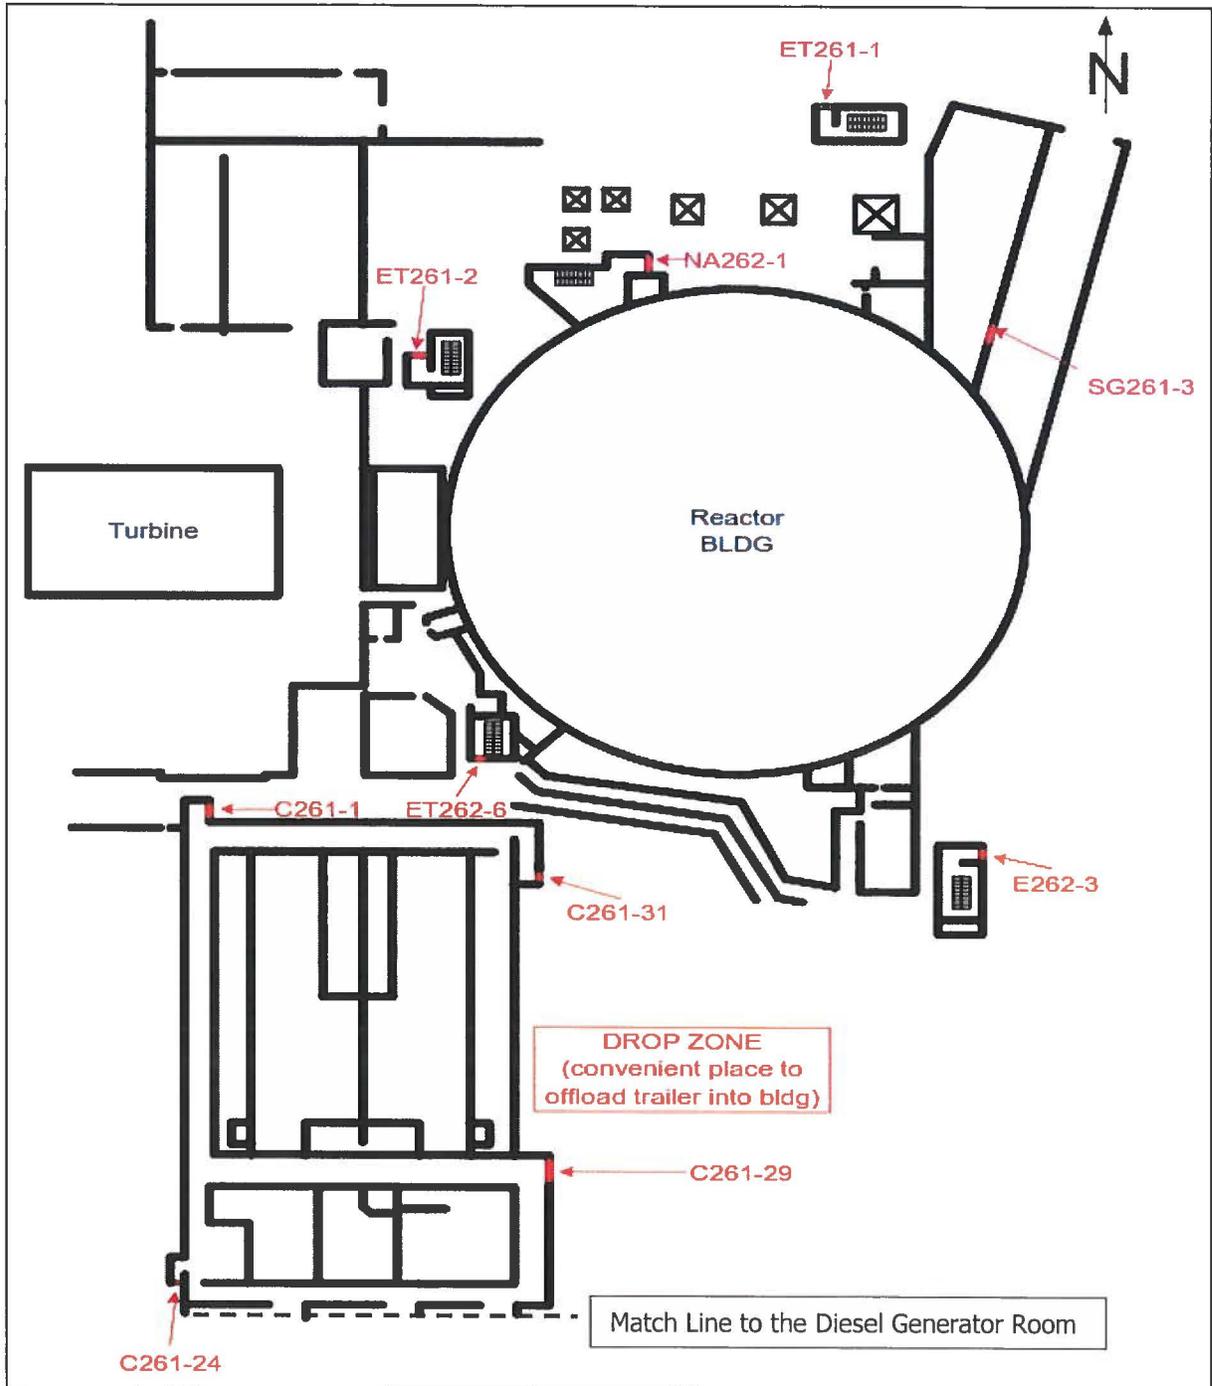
Location of Temporary Flood Protection Barriers in Unit 2
